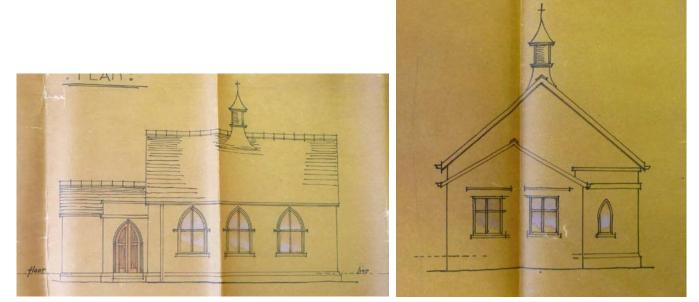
(left): Front (west) external elevation from the original drawings of 1923 (CAC(K) WS/RD/SW/Plan 107 1923)
